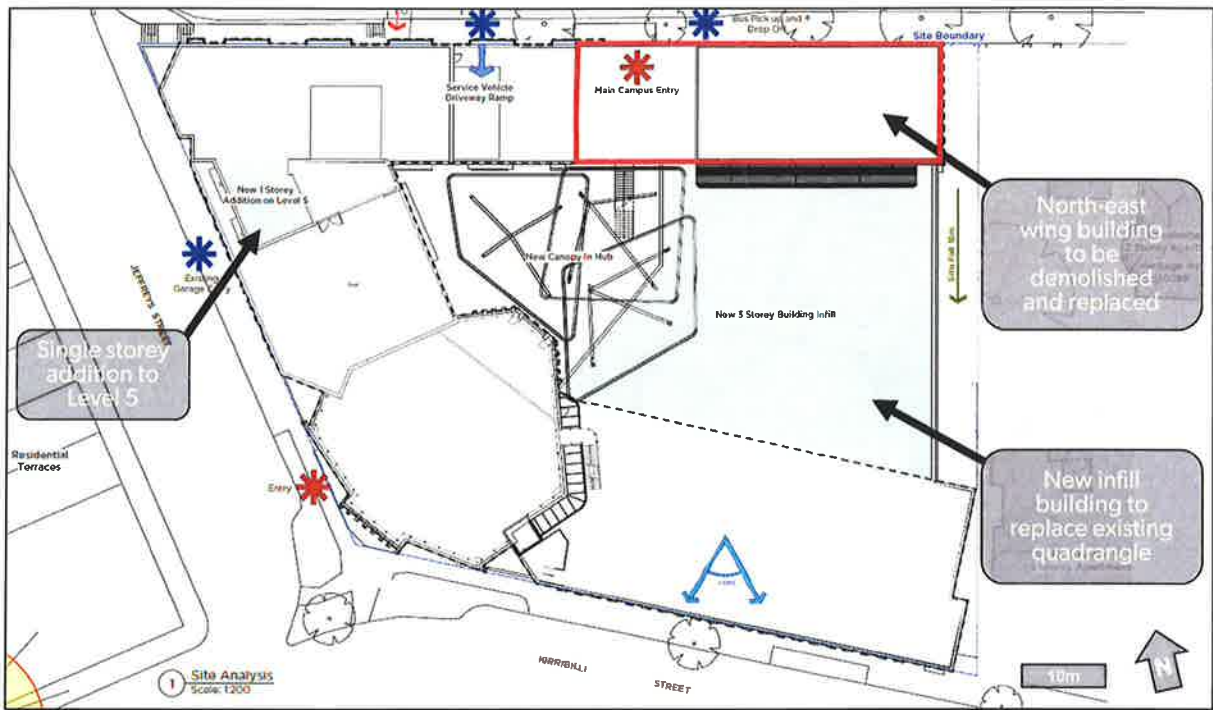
| Main Campus – Proposed Site Layout (Source: Applicant’s EIS 2018)
